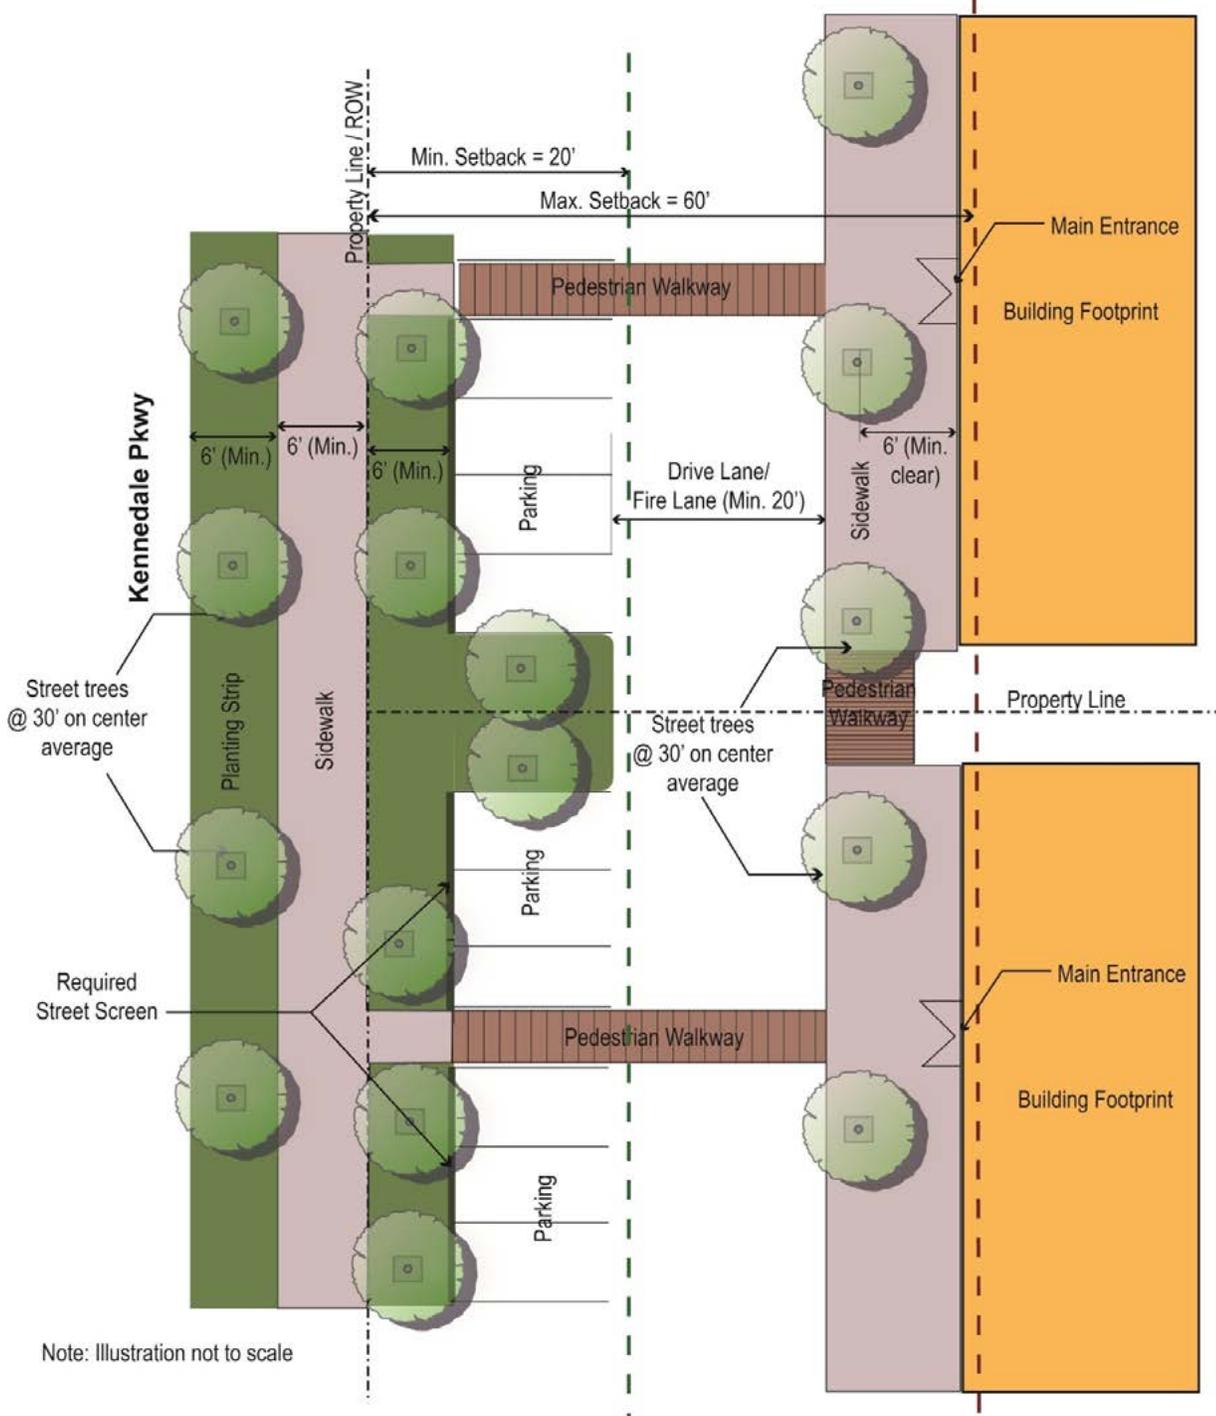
Example of Parking Area Showing Required Streetscape and Site Design for Properties along Parkway Street Type and I-20 Frontage Road.
